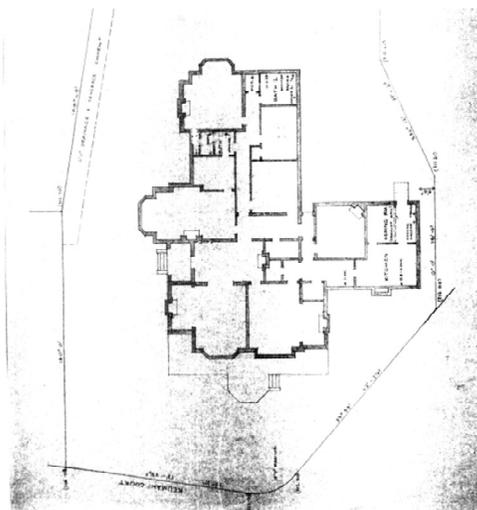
Extract from building permit plan (Source: BP 18378, held Boroondara City Council)
